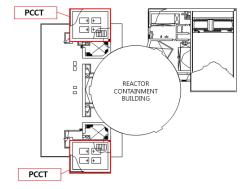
The plan view of PCCT in auxiliary building of APR+
